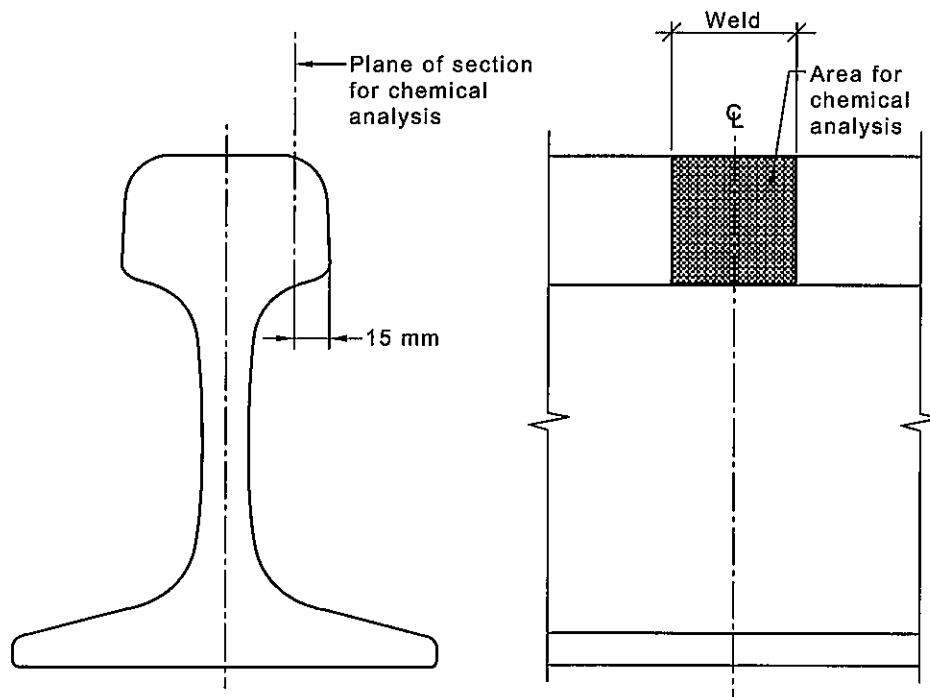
POSITION FOR CHEMICAL ANALYSIS OF WELD MATERIAL
